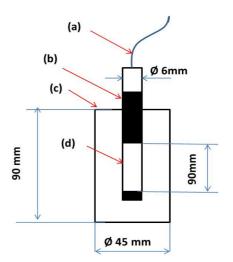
Shape and size specimens: (a) electrical wire, (b) steel rebar, (c) mortar, (d) active surface of steel rebar
